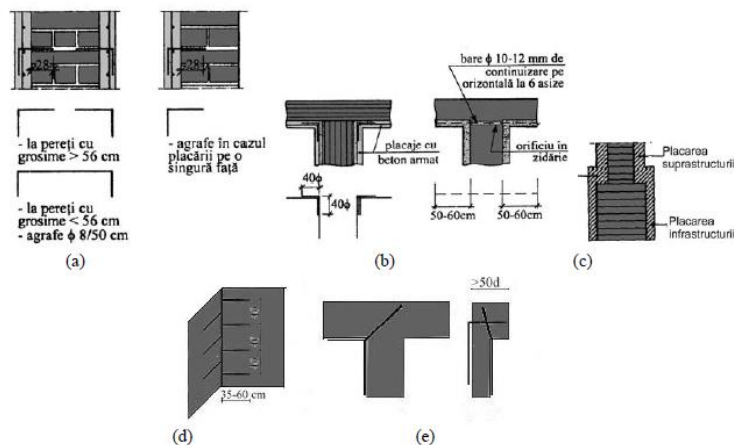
Details of masonry cladding with plaster / reinforced concrete used in Romania:
